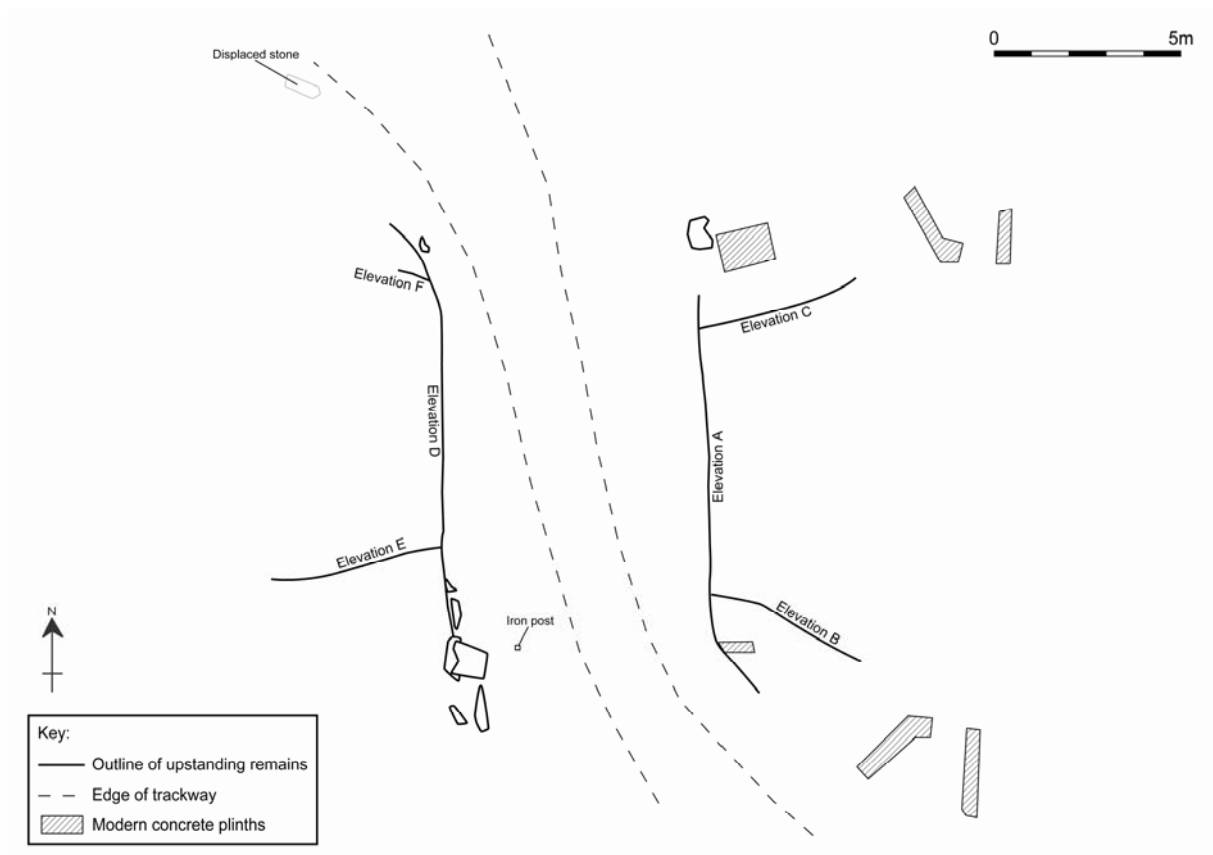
Structure 4, Rusticated Bridge #2 (Lower Bridge): Plan of Structure
